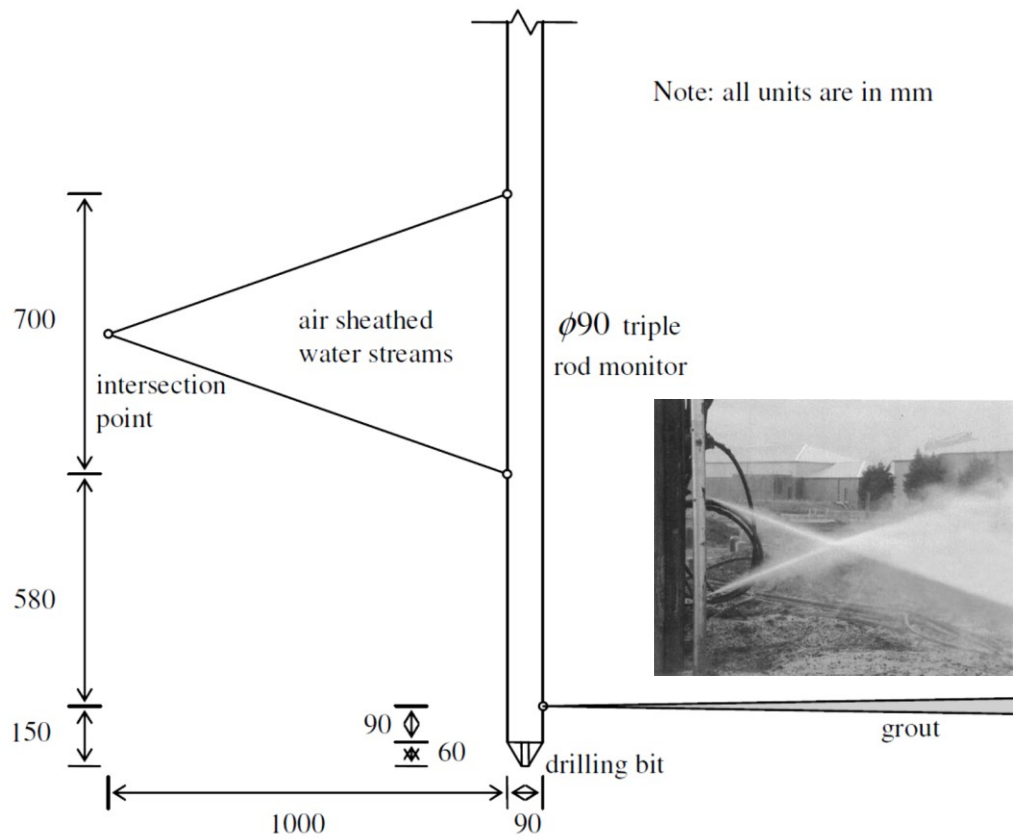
Schematic and dimensions of X-Jet grouting system (Ji 2008)
